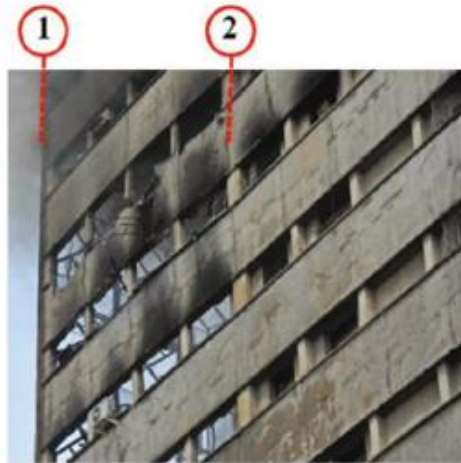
The west side view of the corner shows the multiple collapsed ceilings.
